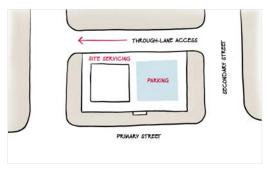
Provide access to site servicing and parking at the rear of the building or along a secondary street. Through lanes are encouraged where site conditions allow (7.1.4. a).
